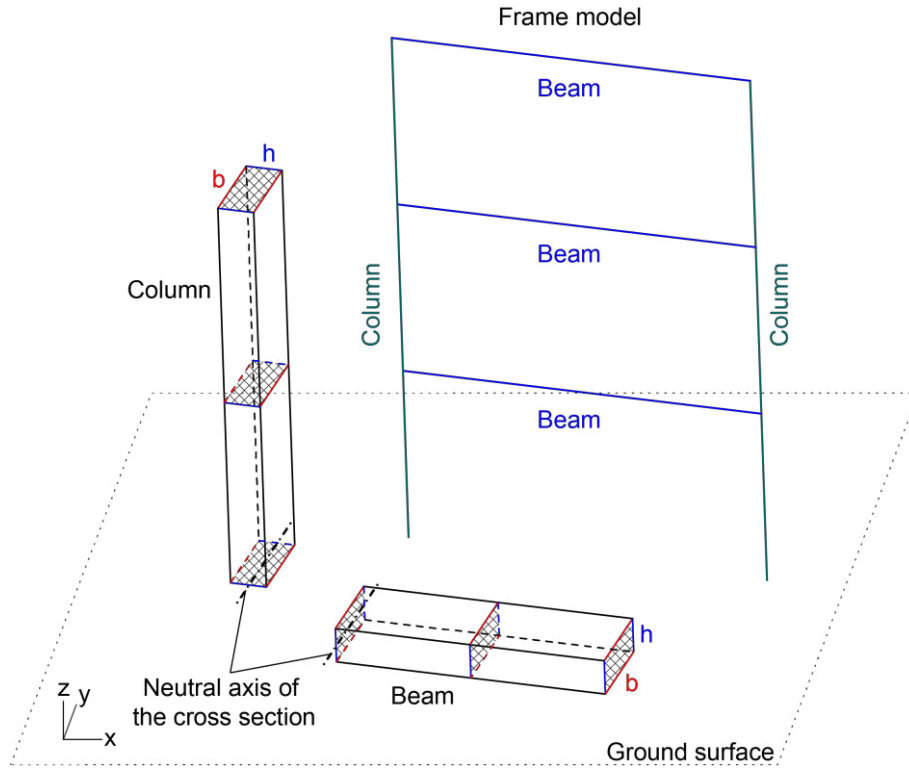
Typical rectangular cross sections of the column and beam of a plane frame model
